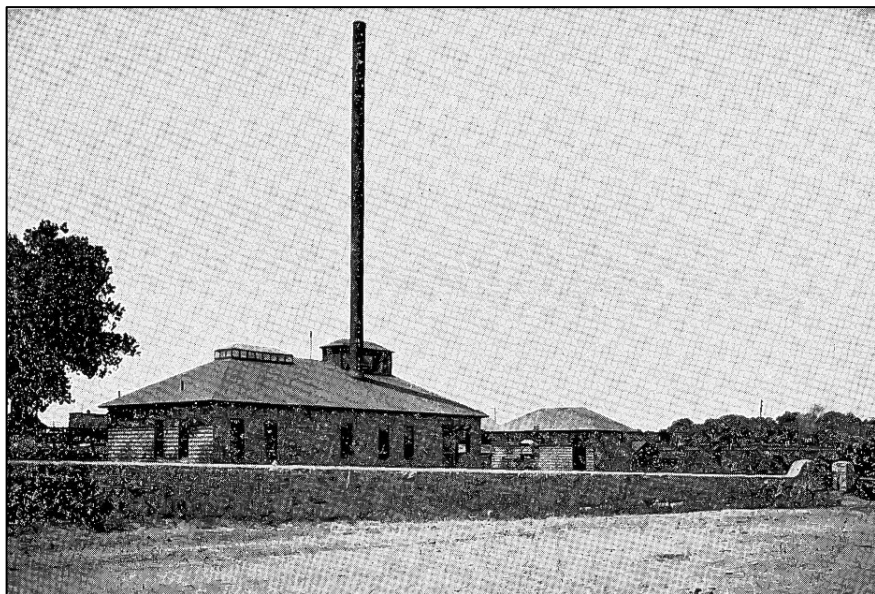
The new water works buildings in about 1905 (Weinzirl, 1905, follows p. 4), showing the boiler and pump house with the tall chimney at the left, and the coal house, next to the railroad, on the right. Tijeras Avenue is in the foreground.
